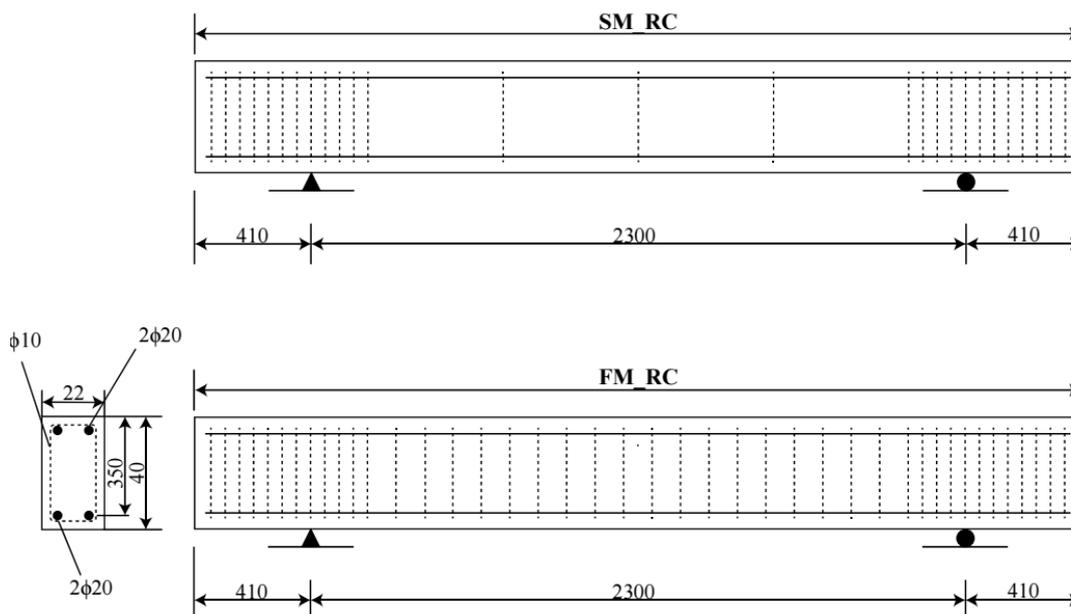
Construction of SM\_RC and FM\_RC specimens (Unit: mm)
